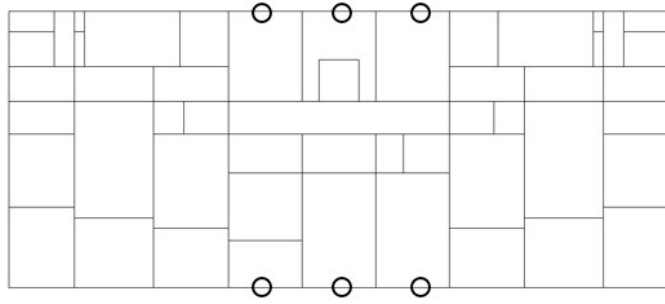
Damper Placement at roof floor (R-X); MSSSA: 6 dampers
